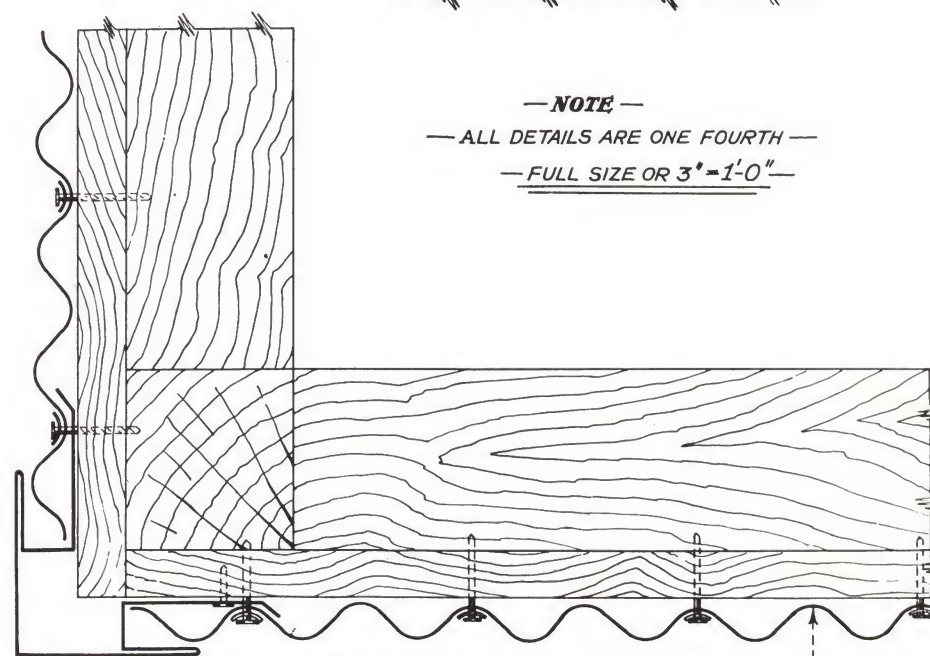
SECTION ON LINE H-H IN FIG. 2 DRAWING N° 1
